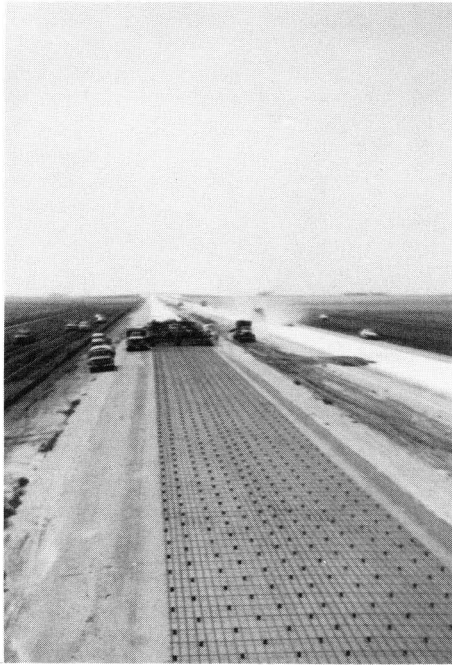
APPROACHING PAVING TRAIN LAYING 24-FOOT BY 8-INCH CRCP ON ASPHALTIC CONCRETE LEVEL-UP. CHAIR-SUPPORTED CONTINUOUS REINFORCING STEEL IN FOREGROUND WAS FABRICATED FROM DEFORMED STEEL BARS.
